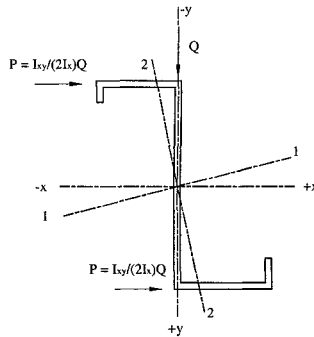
Principal Axes and Resulting Brace Forces for Z Section
